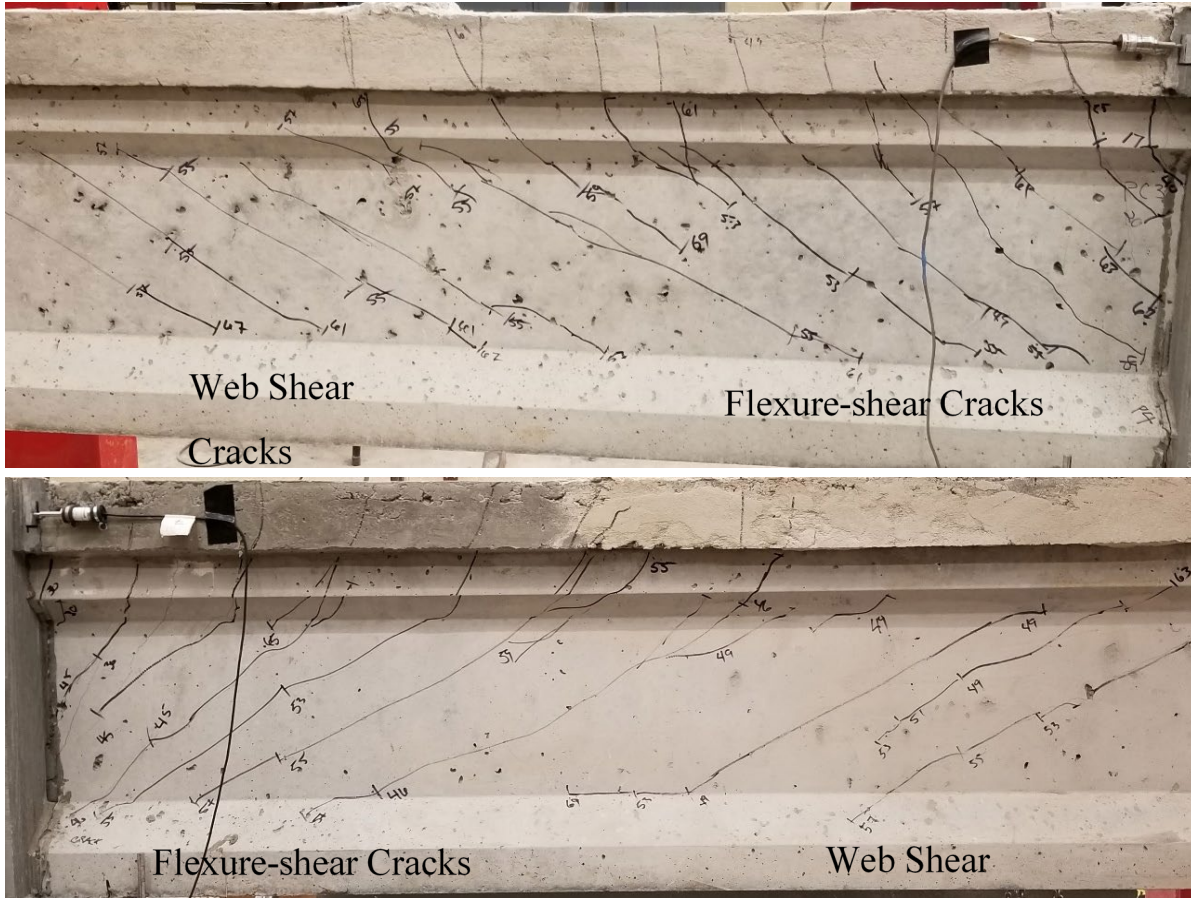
RC3-N girder with flexure-shear cracks and web shear cracks (top) and RC3-S girder with flexure-shear cracks and web shear cracks (bottom)
